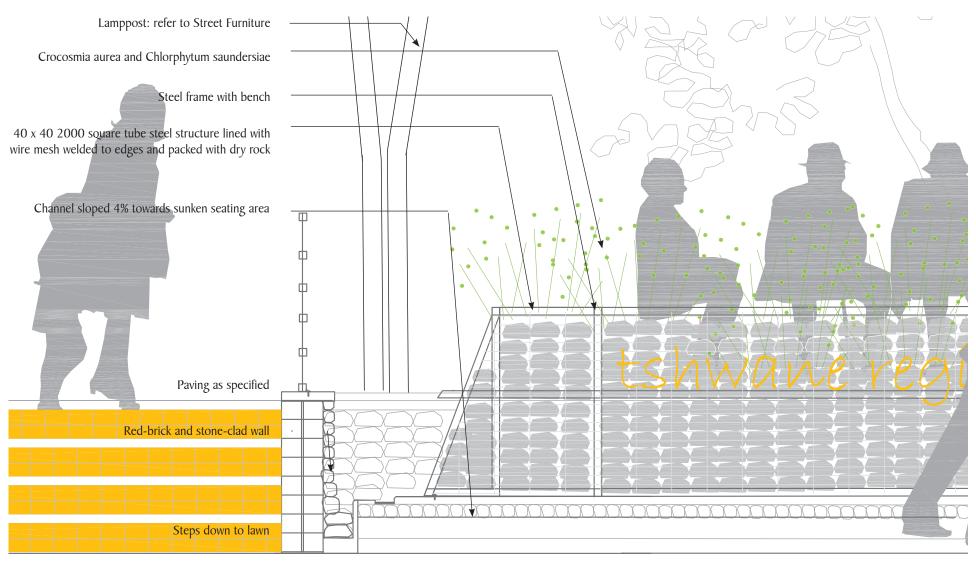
Elevation of feature wall connection to walls, steps and ramps. (Author, 2008) Scale 1: 20
